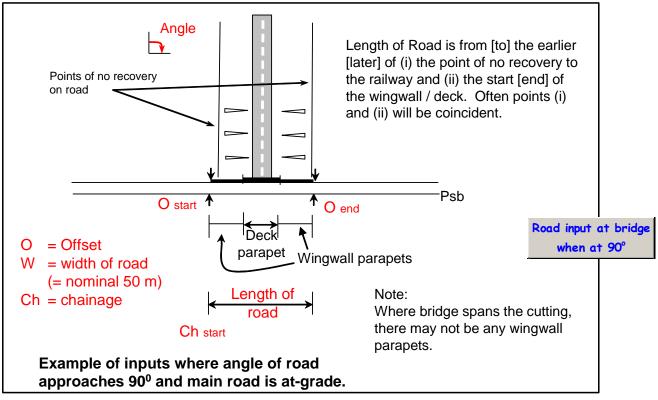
(g) Road crossing under Road where at-grade and or at 90°
